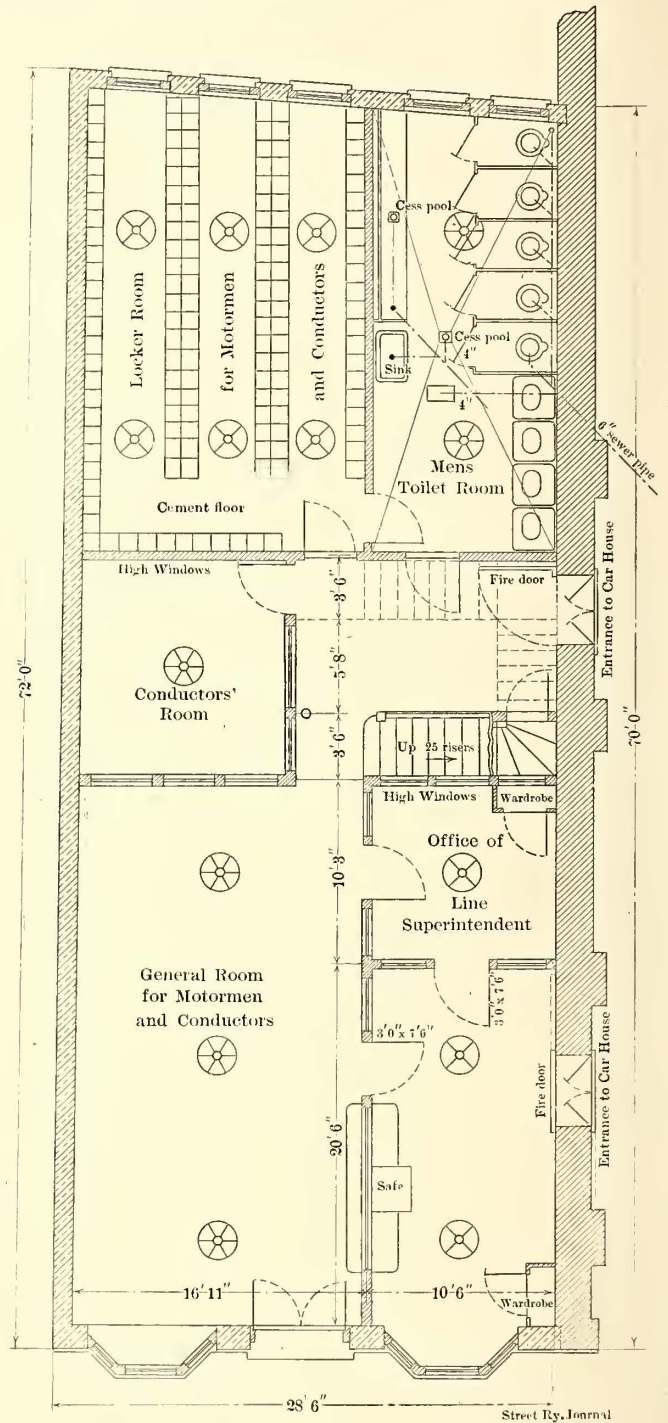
PLAN OF GROUND FLOOR OF SERVICE BUILDING AT LIGHT STREET
